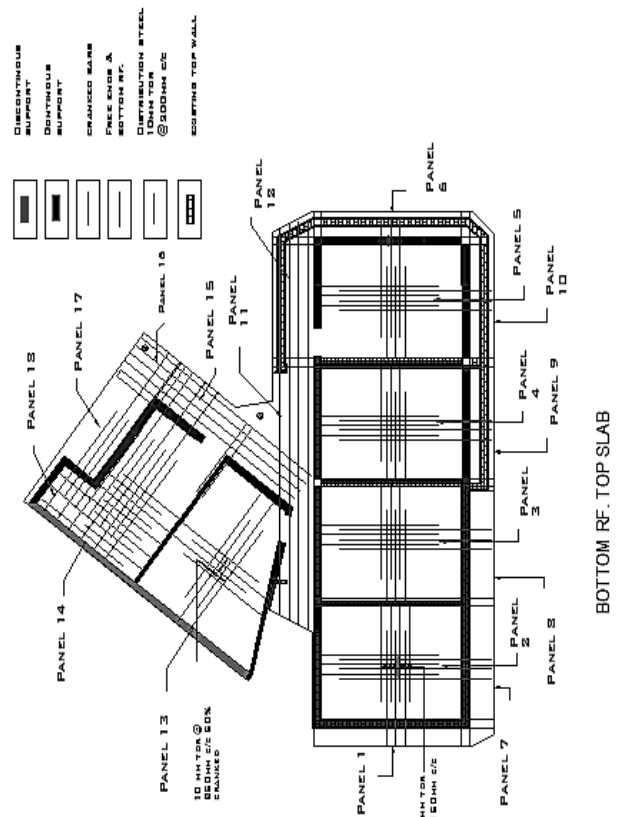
Bottom Reinforcement Provided in Top Floor Slab
